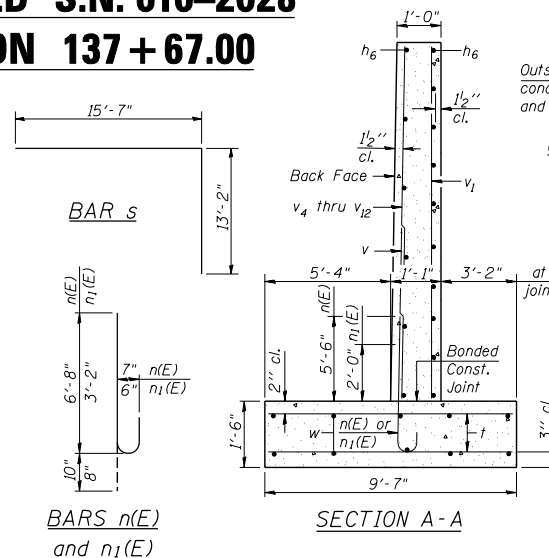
DETAIL OF CAST IN PLACE BOX CULVERT END SECTION
